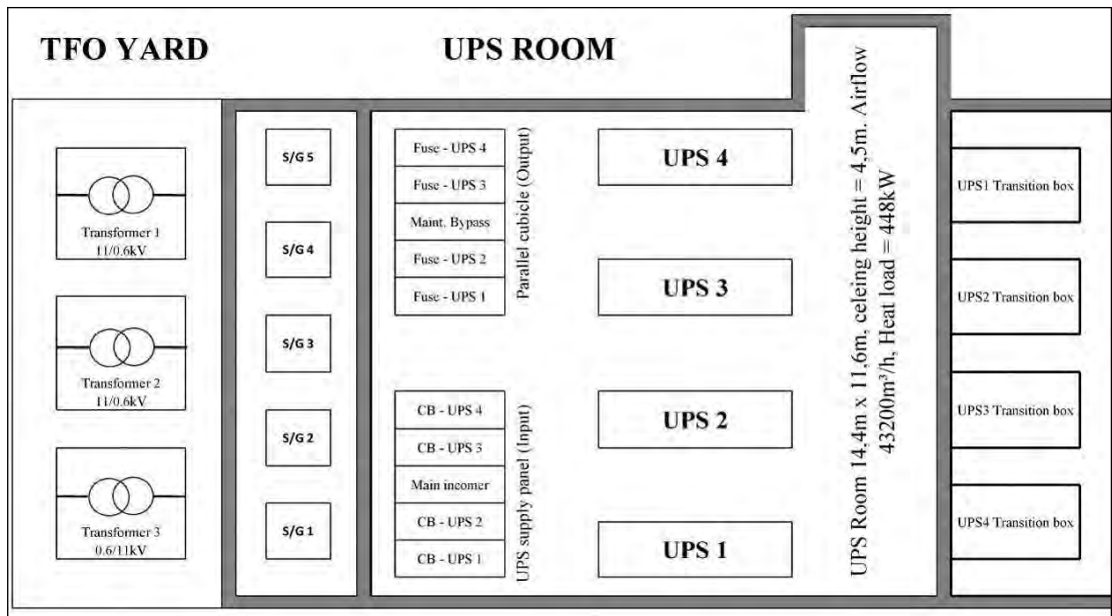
Current UPS parallel system layout - Top view (NTS)
